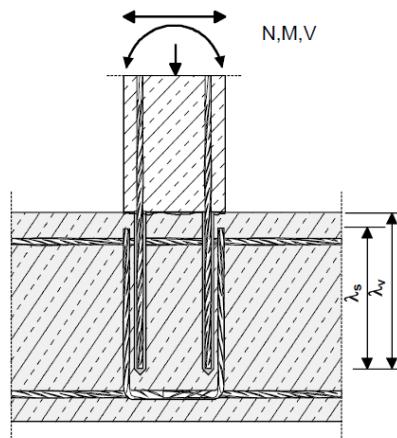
Overlap joint at a foundation of a column or wall where the rebars are stressed in tension
